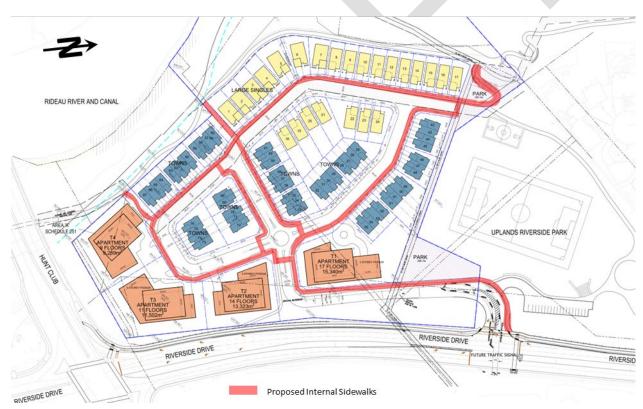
Proposed Sidewalk Connections and Active Transportation Routes to Transit
